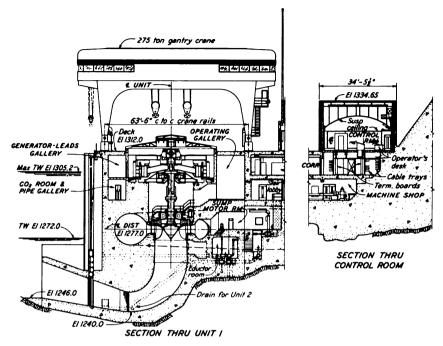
Hiwassee powerhouse cross section—unit 1.
